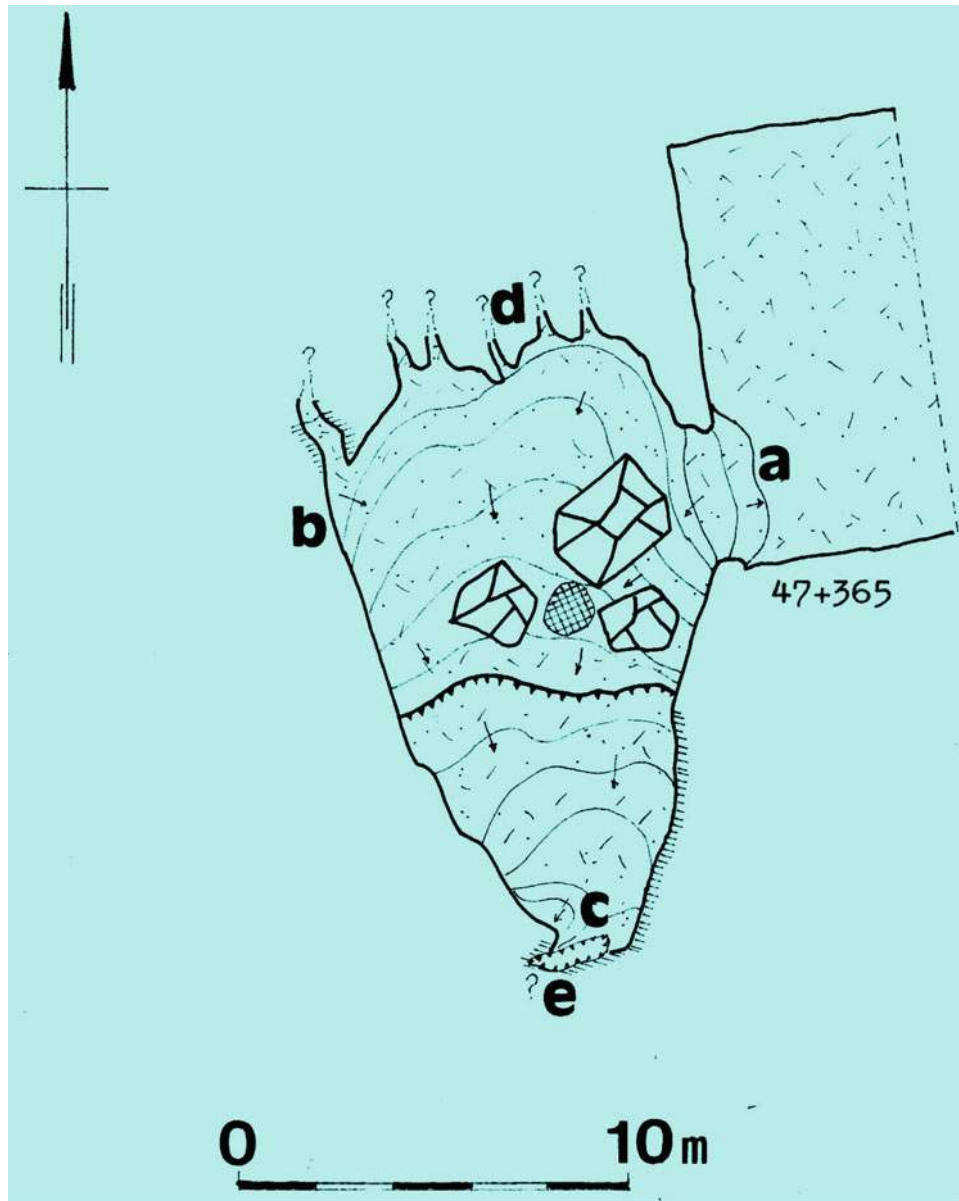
Plan of cavern at km 47 + 365 in Vršek Tunnel
